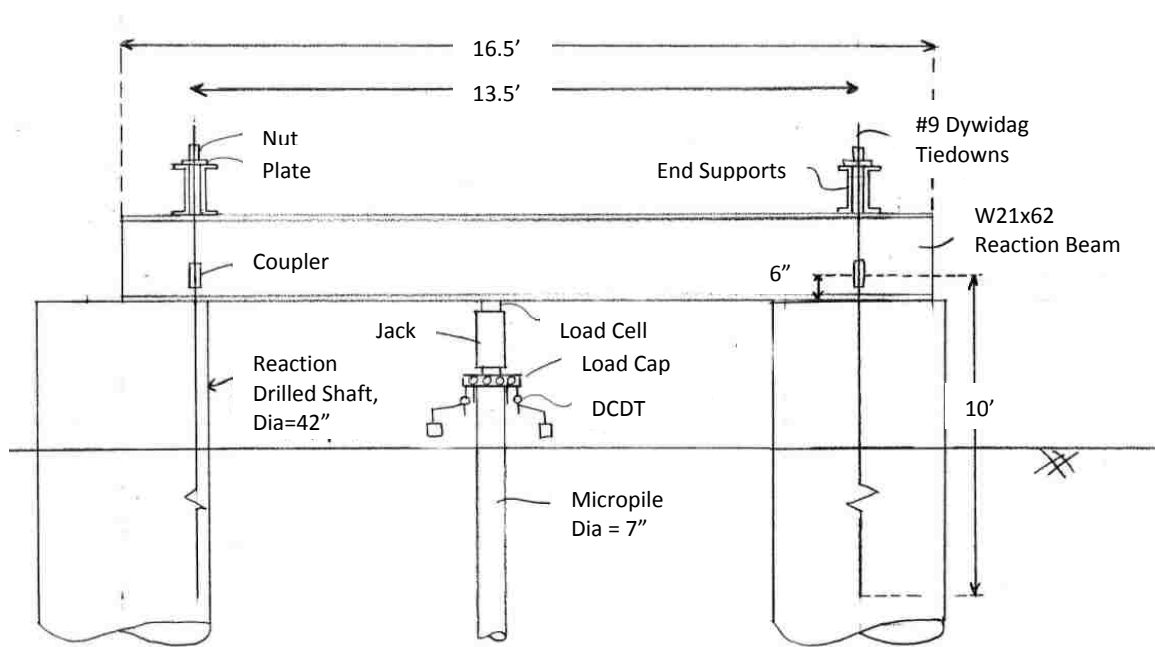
Front Elevation View of WTS Axial Load Frame
